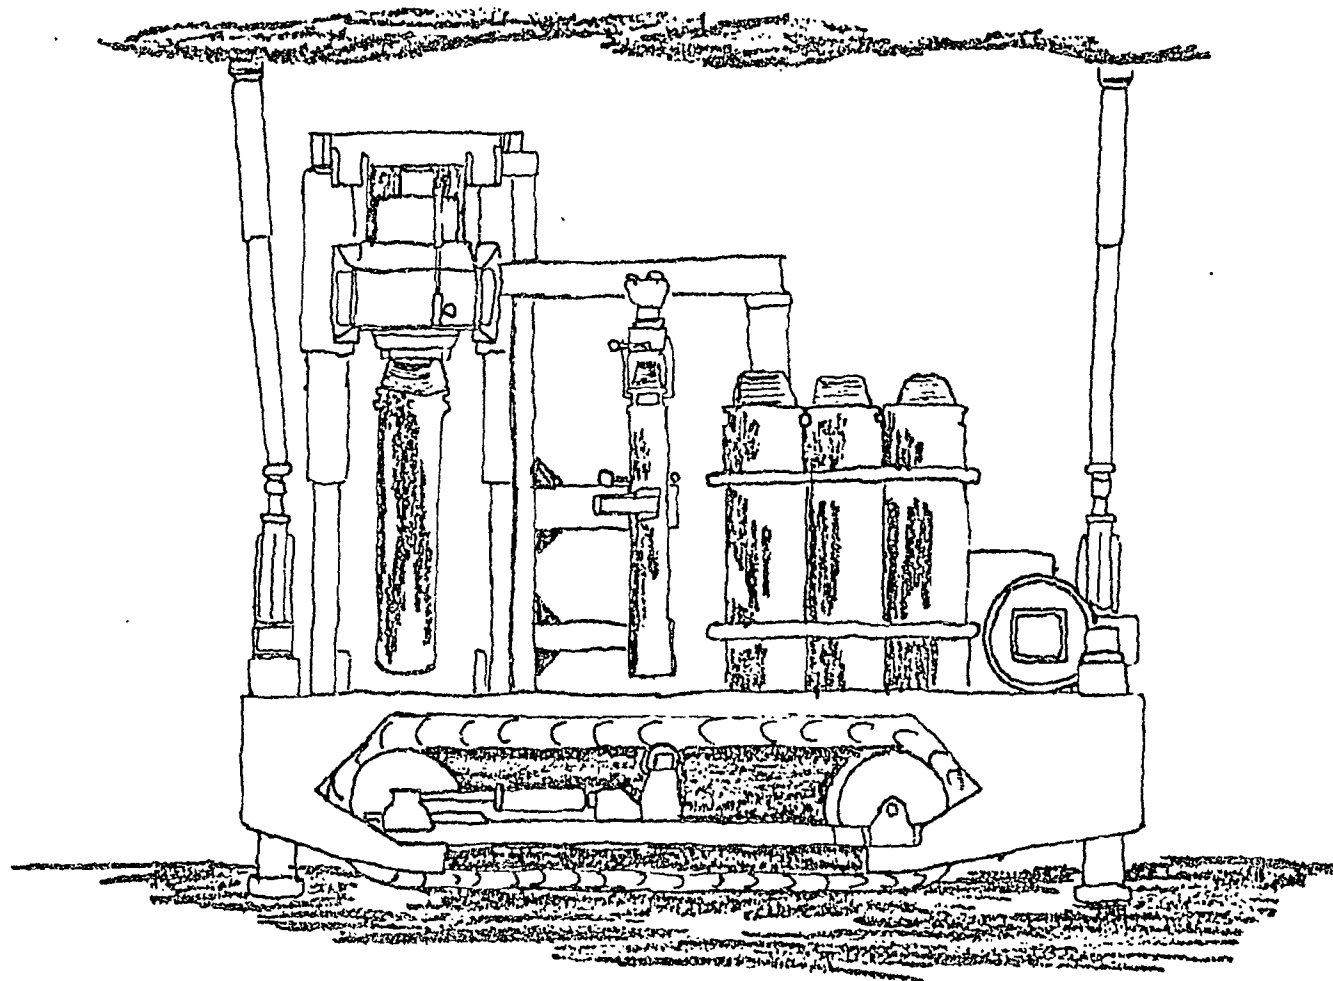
Crawler Mounted Rotary Drill with Roof Jacks and Steel Handling Systems
